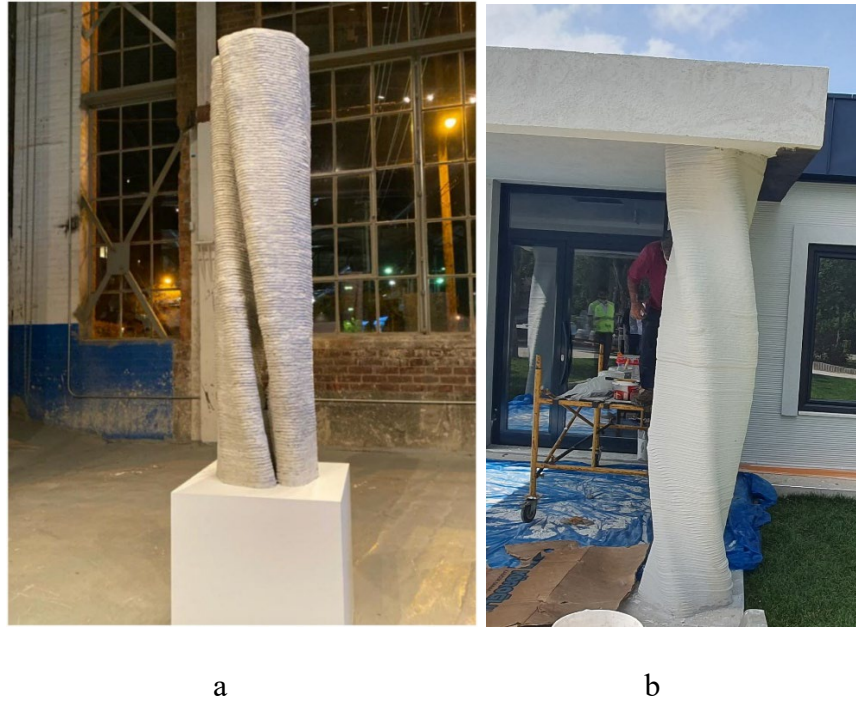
(a) Twisted column, University of Michigan (Li et al., 2020), (b) Twisted column, ISTON 3DCP office building entrance.
